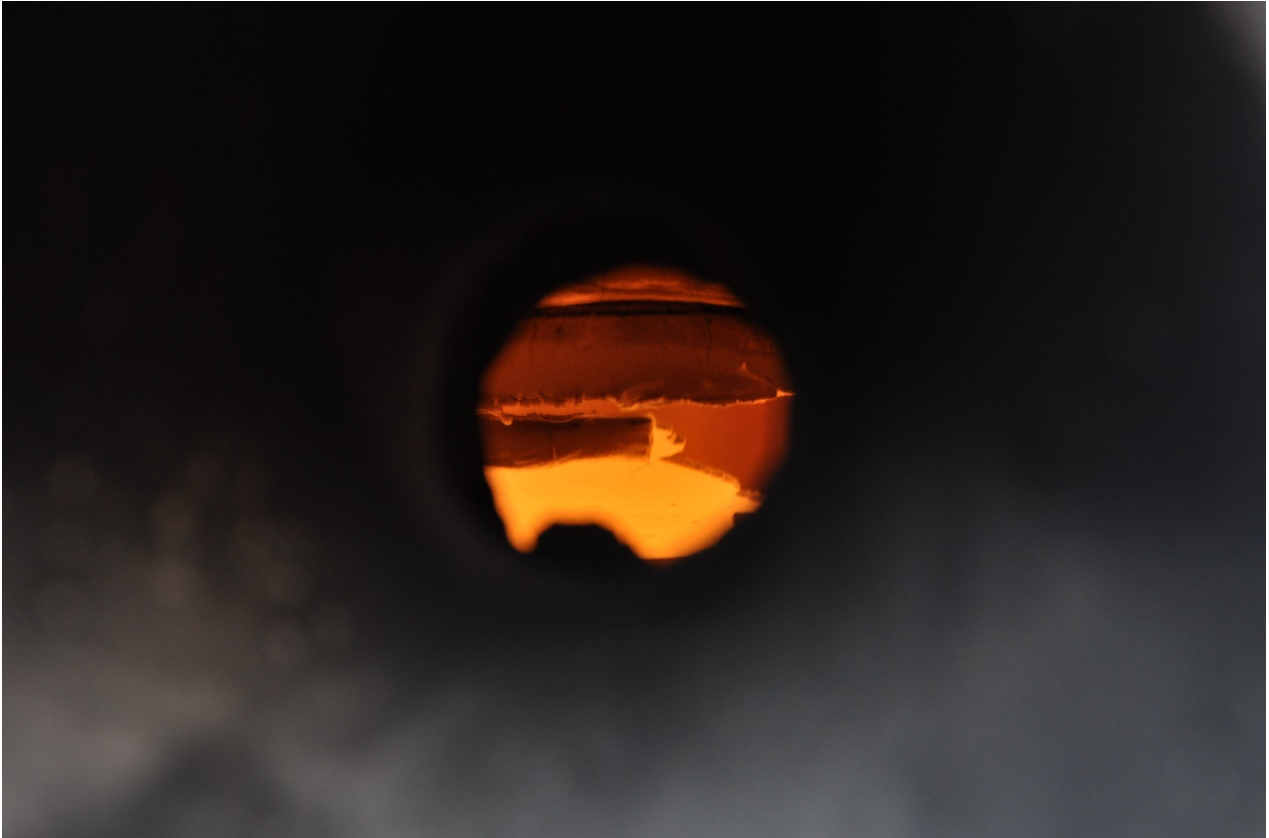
Bottom board fragmenting (mid-section of specimen)
